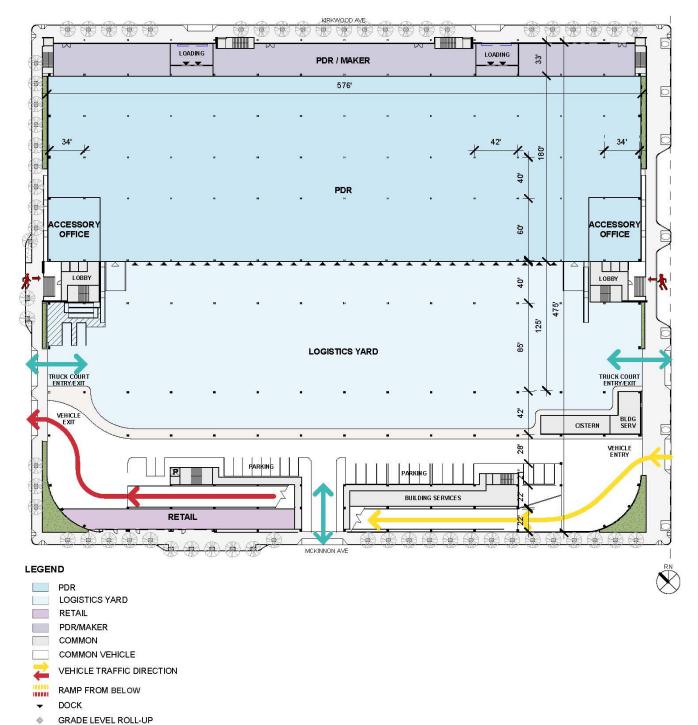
D-3 Proposed Project Floor Plan – Level 1 (Buildings A and B)
